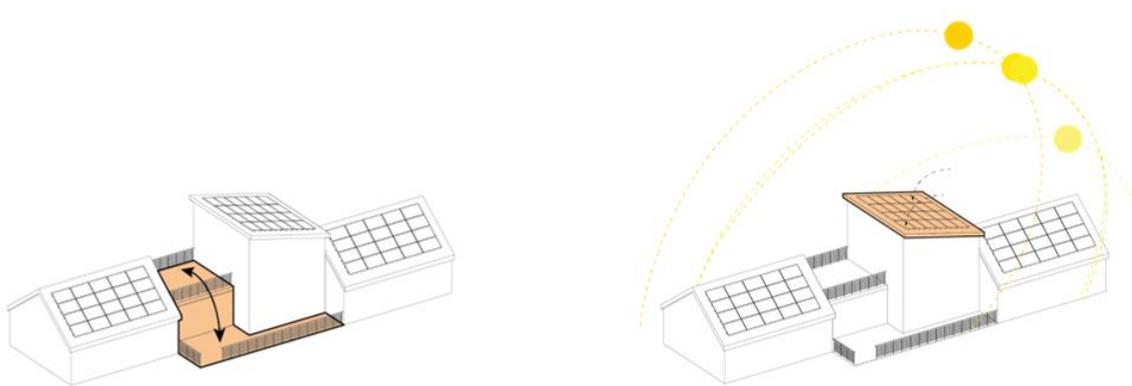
Outdoor deck connection and south sloping roof with solar panels.
